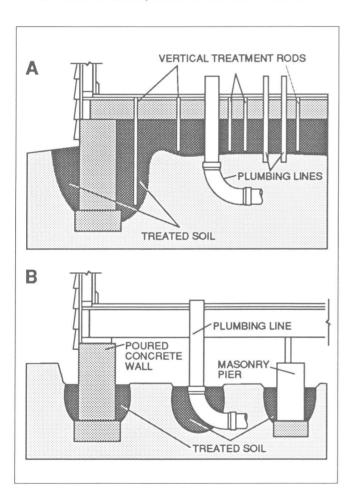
Treating soil adjacent to foundation to control subterranean termites. (A) Treating through a concrete slab foundation by drilling through the slab and injecting chemicals through grouting rods. (B) Treating soil around foundation wall and around pipes and piers in a crawl space.
